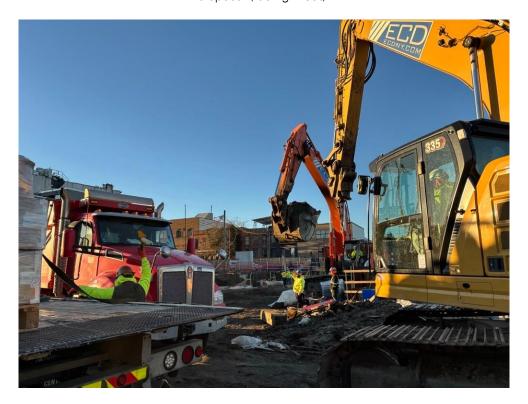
ECD live loading non-hazardous non-native fill into tri-axle trucks for off-site disposal in the western part of the site (facing southwest)
